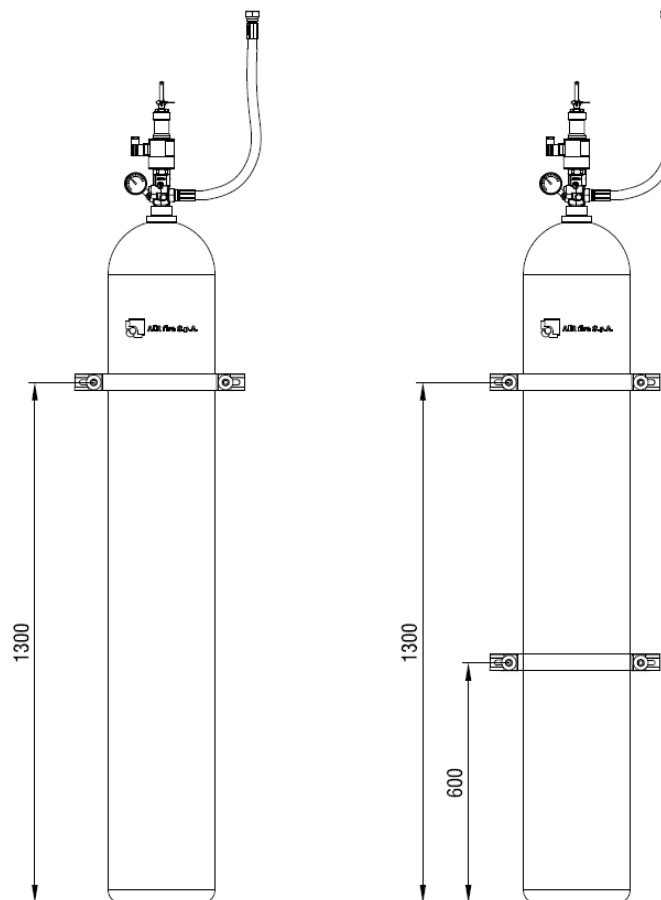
Modular cylinder single level and double level brackets, dimensions
